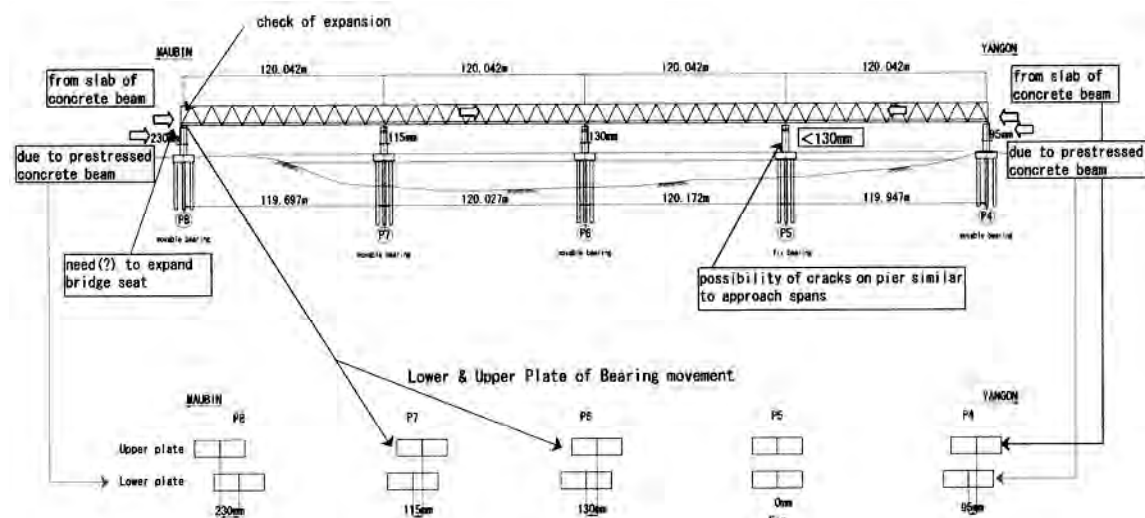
Lower & upper plate positions of bearing on piers of Maubin Bridge
